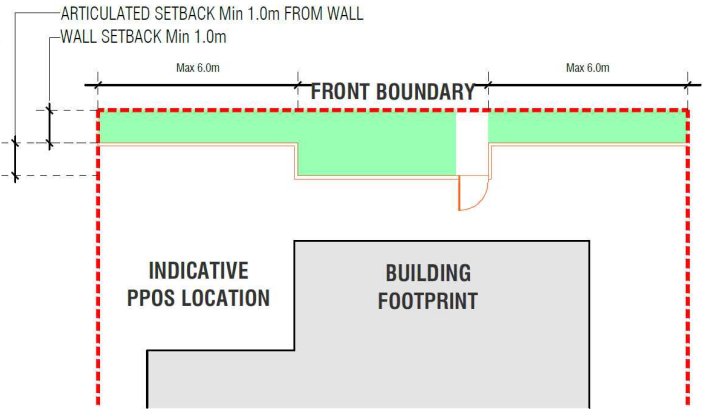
EXAMPLE - COURTYARD WALL, SHOWING A HOME FRONTING OPEN SPACE, WITH AN ARTICULATED GATE ENTRY AND PLANTING ZONE.
